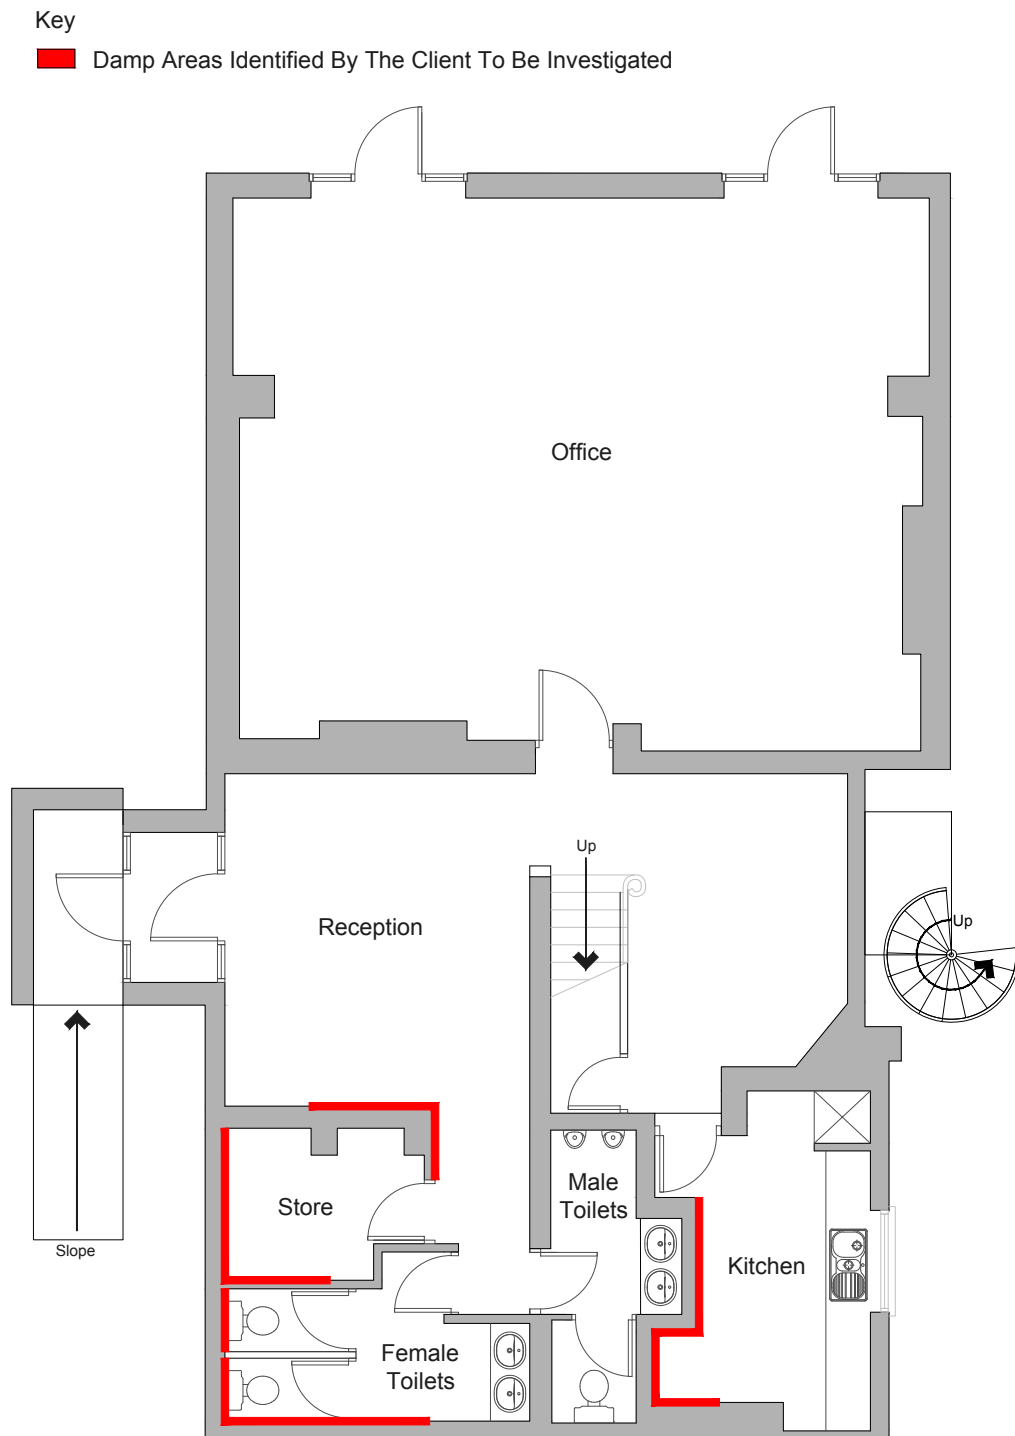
Building Layout with Damp Areas requested by Client to be Investigated
